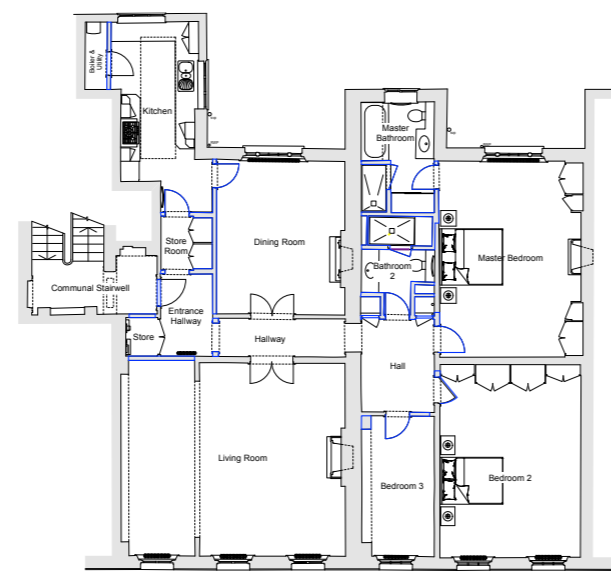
Existing Floor Plan with modern, post 1949 partitions shown in blue.
